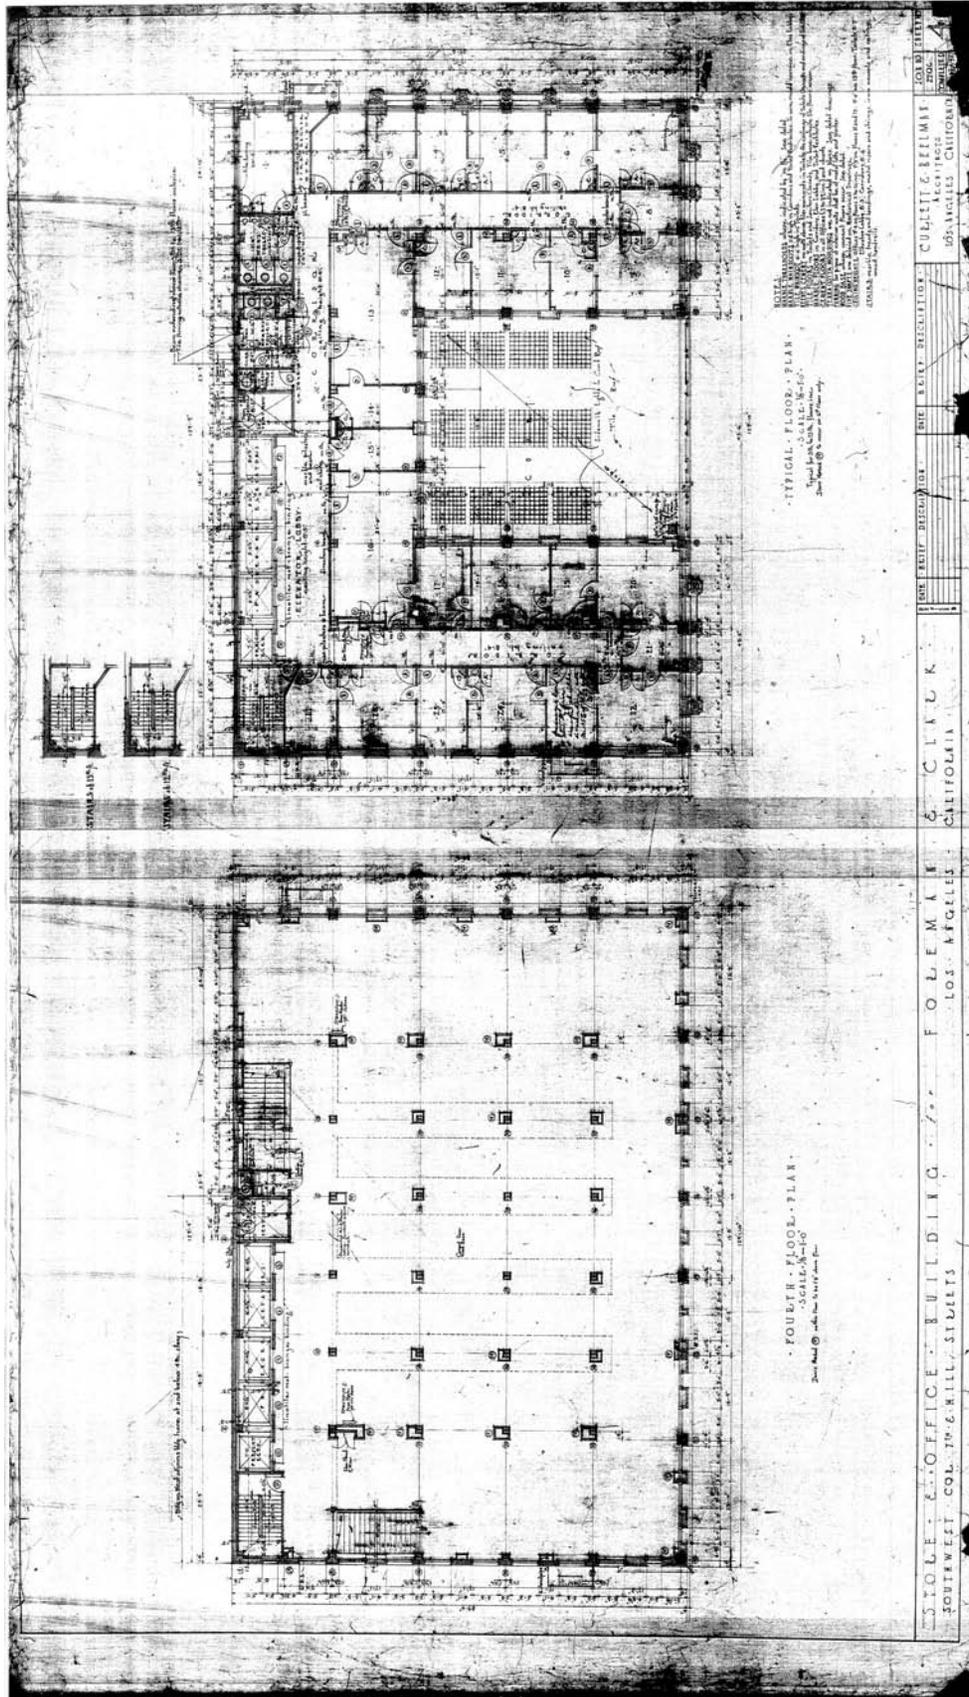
Construction plans for the 4th and upper floors of the Foreman & Clark building. (Curllett and Beelman Architects.)
